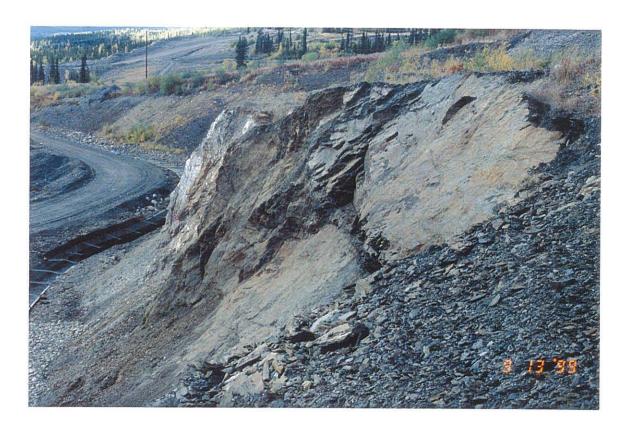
View of the Vangorda Creek diversion cut wall in the segment which failed in June 1999.
